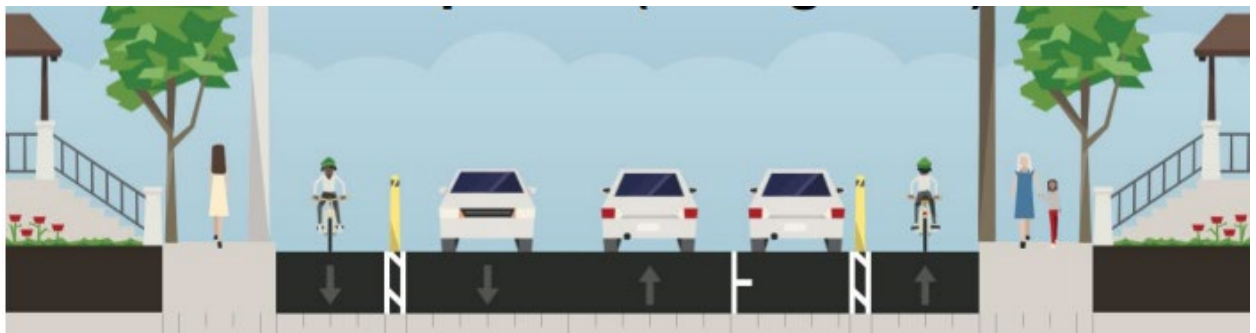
Illustration of the proposed changes on Hallam Street between Dufferin Street and Bartlett Avenue, facing west.
